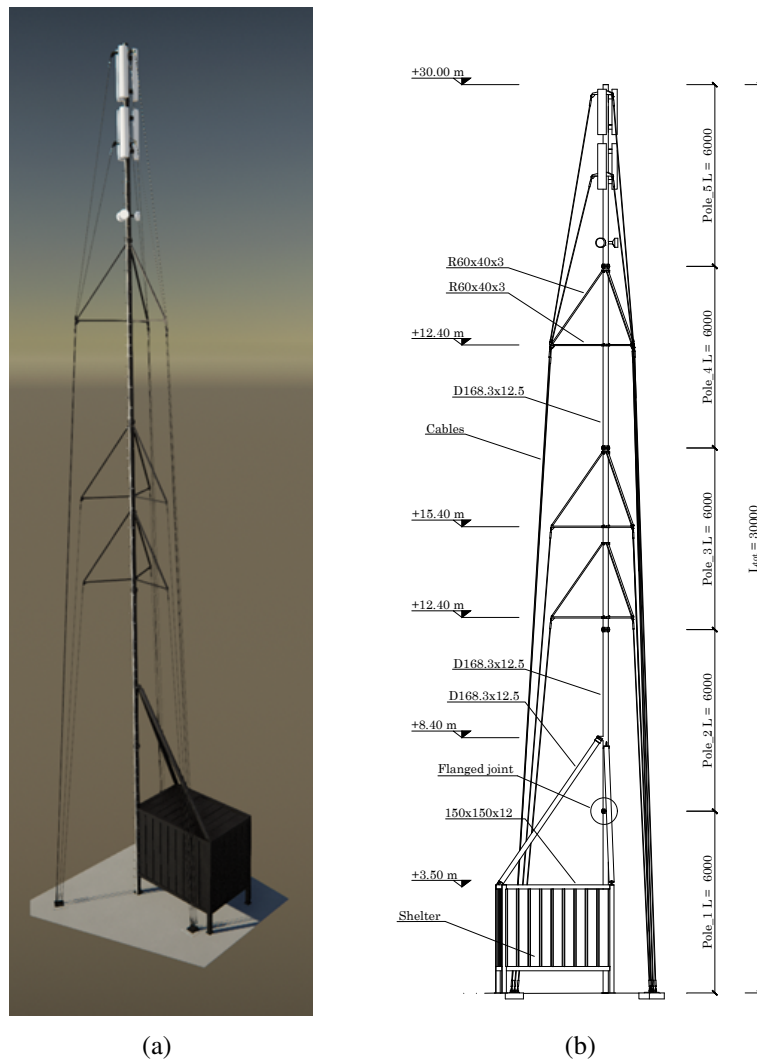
(a) Render model realized using Tekla Structures. (b). Technical drawing of the structure investigated with dimensions in mm.
